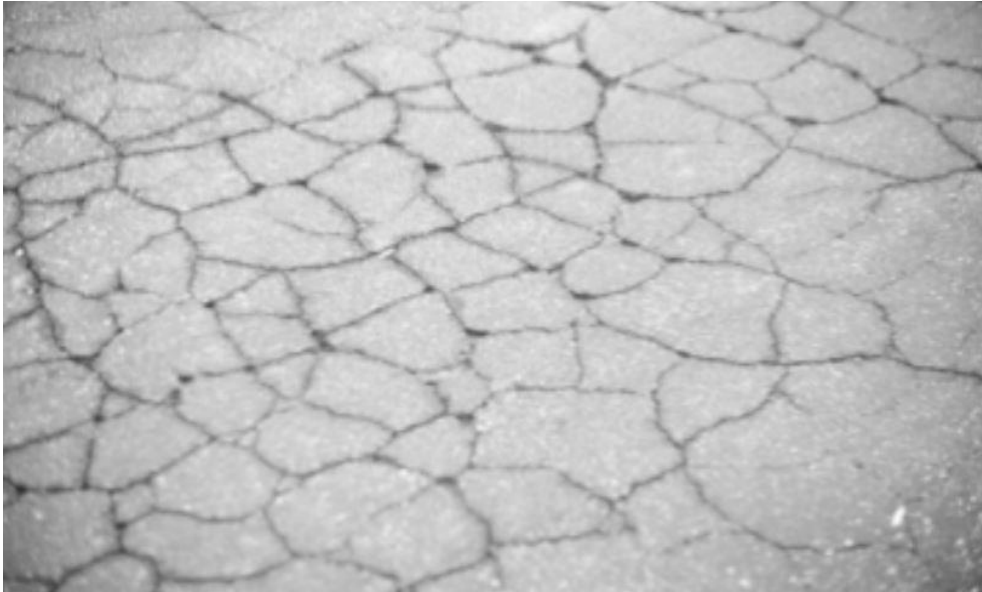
Fatigue (alligator) cracking in Flexible Pavement
